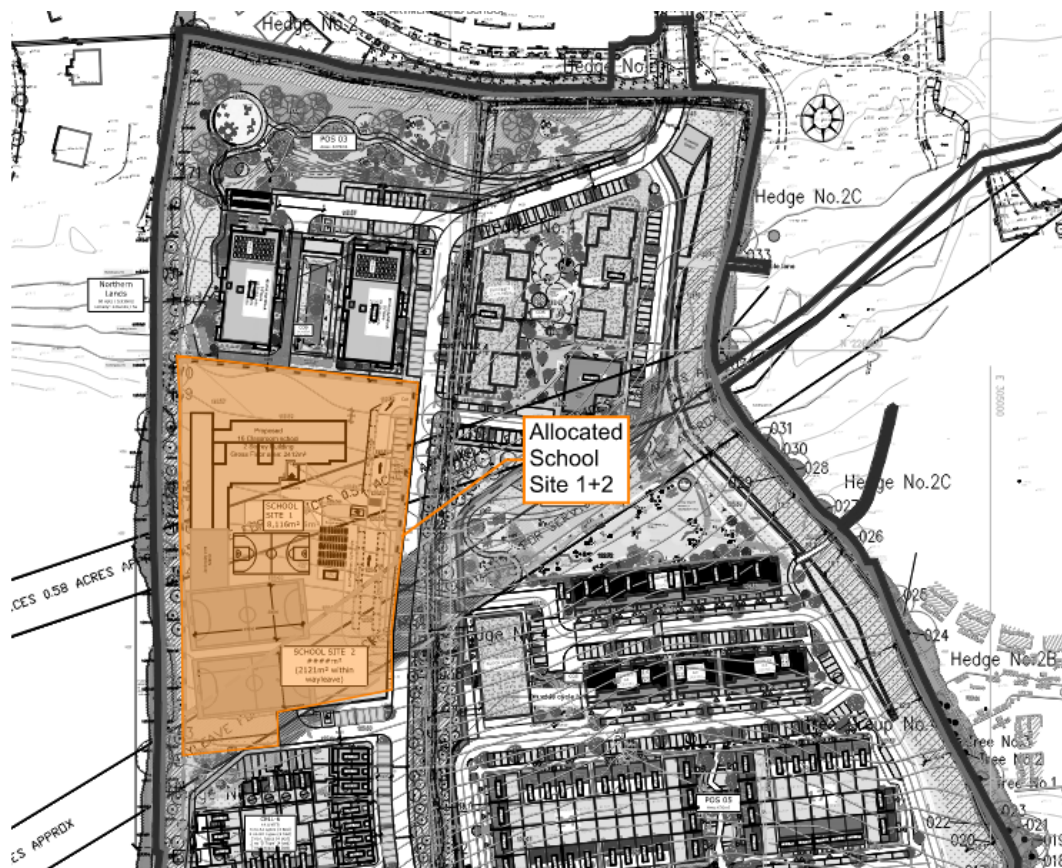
Proposed School Site 1 and Site 2 (Ref: 25.09.26_Boherboy Site Layout Plan 1-1000)
